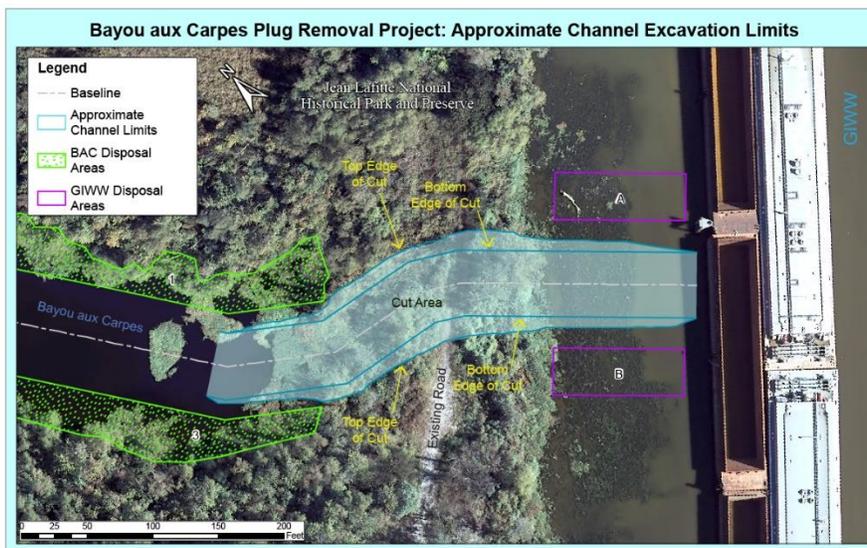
Approximate channel excavation limits (blue line) with elevation survey data collected in August 2020.
